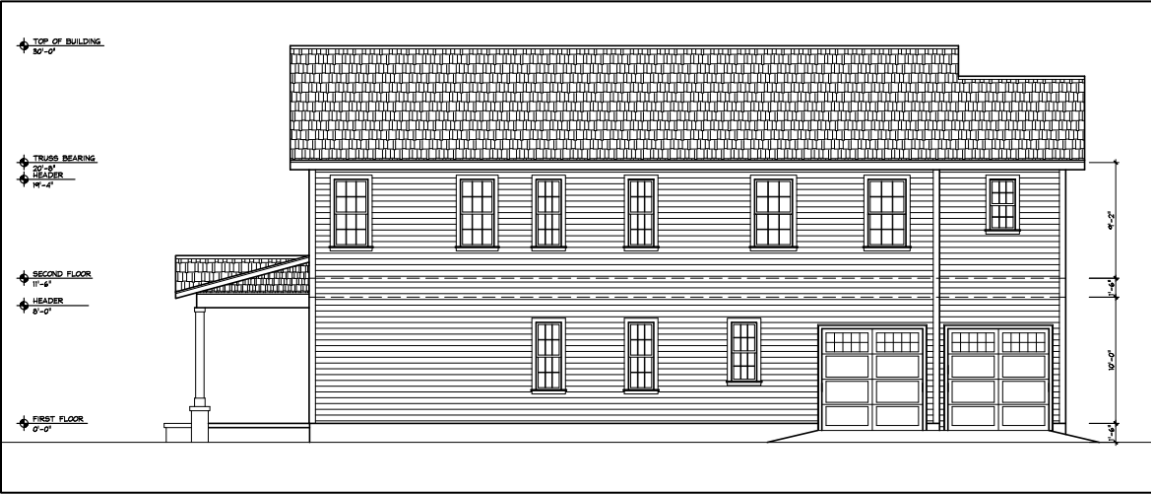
South elevation (to face Calla Terr. N.) of proposed residence
